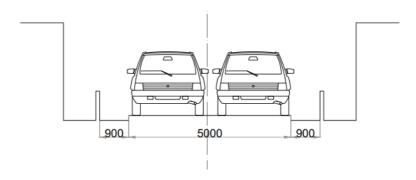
Existing cross section of internal roads (Row - 6.8M)
